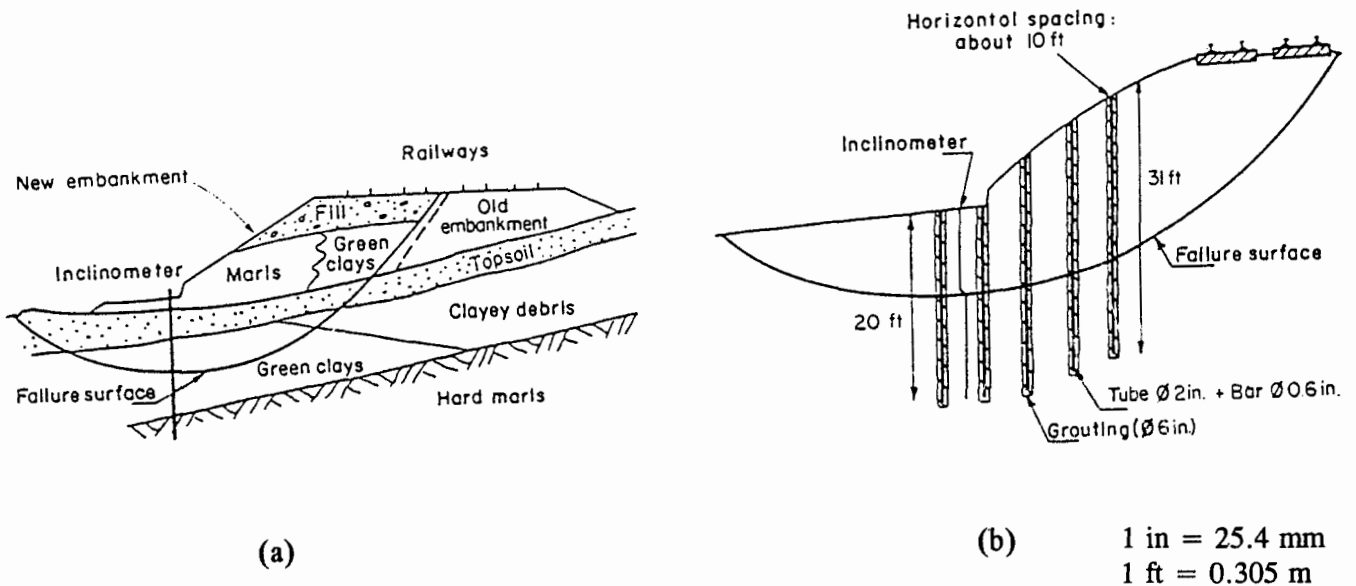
Case study illustrating the use of limit stability analysis approach for slope reinforcement design practice: (a) geotechnical cross section of a railway embankment and (b) sliding slope stabilization by nailing (Guilloux and Schlosser, 1984).
